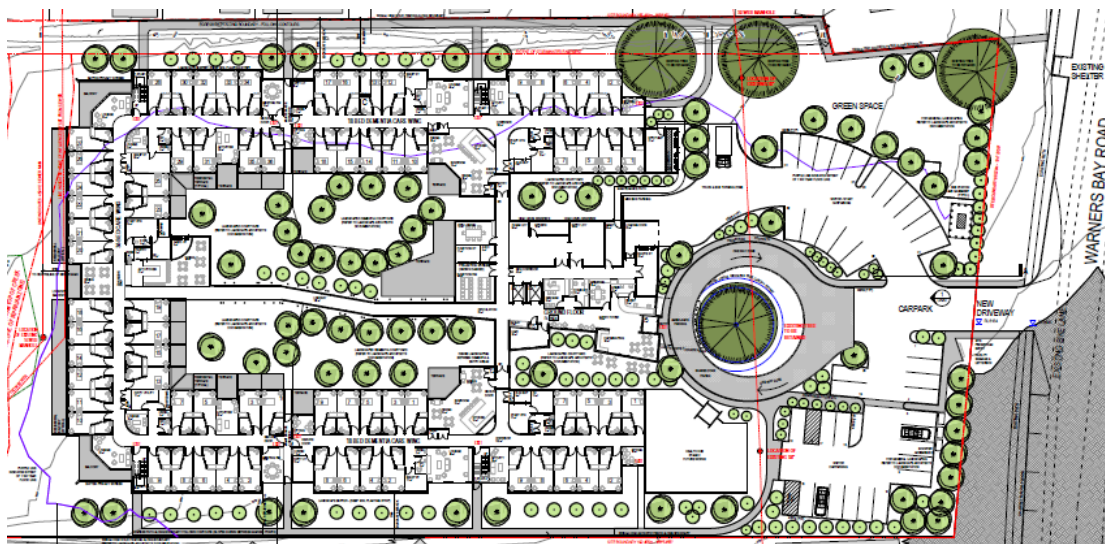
Sub Floor Plan (purple shading shows extent of 1:100 year flood line)
